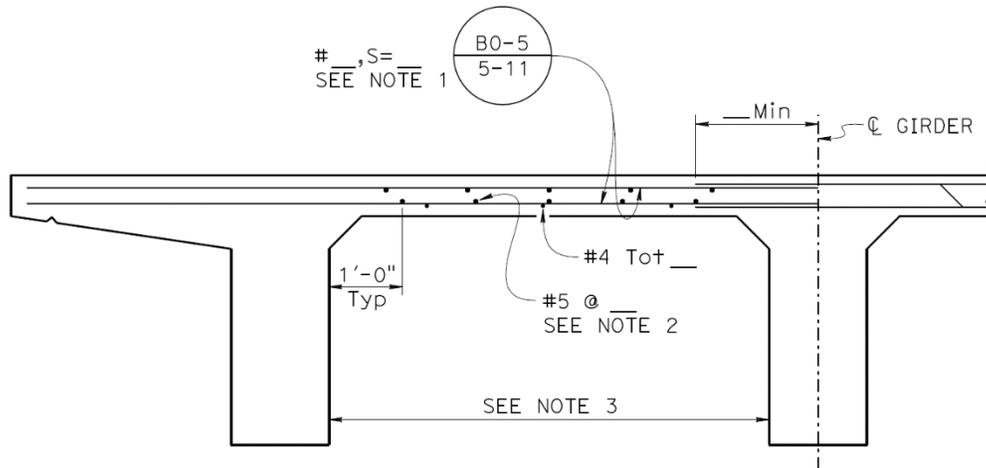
Transverse Reinforcement for Exterior Girders
